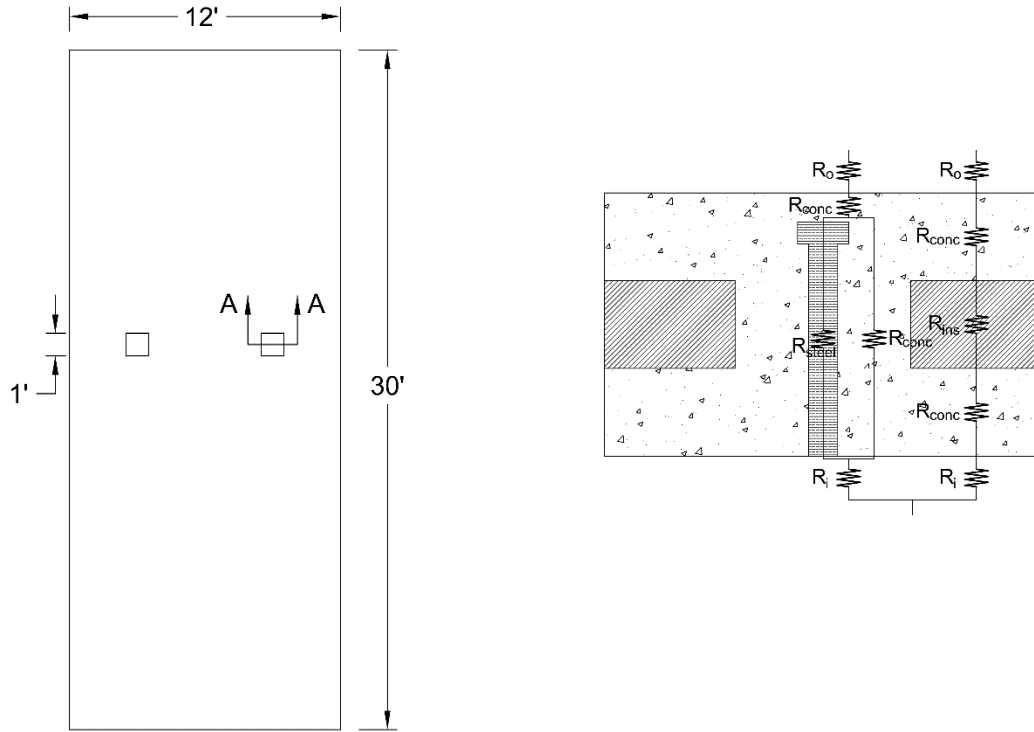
Panel layout and cross-section with electrical circuit analogy
